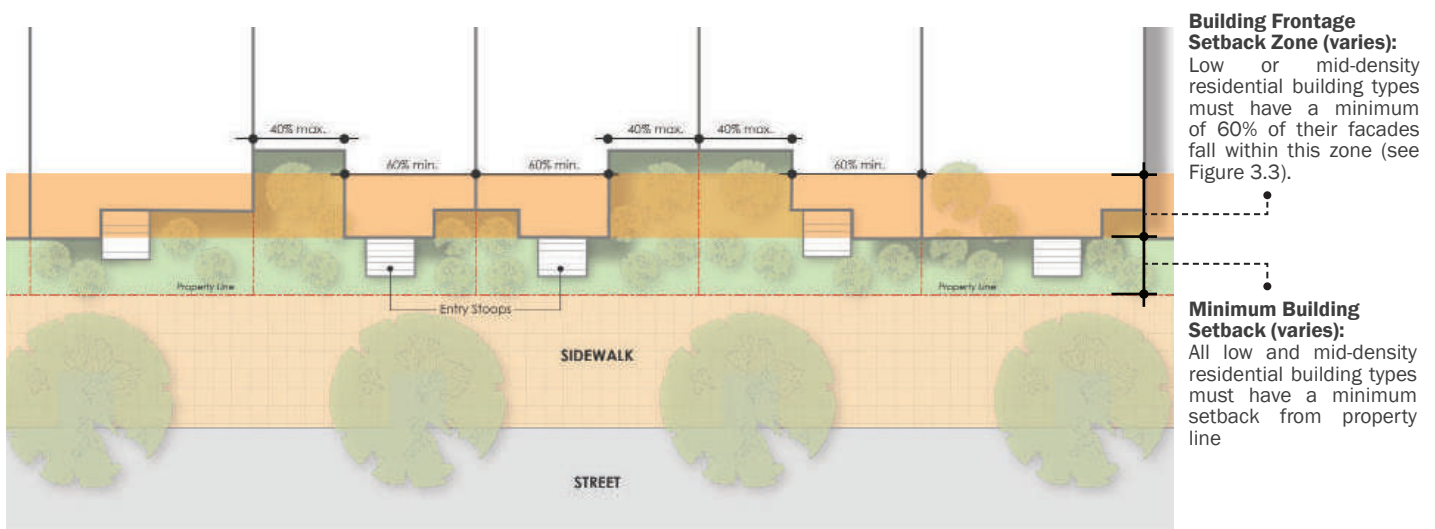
BUILDING FRONTAGE REQUIREMENT PER BLOCK
